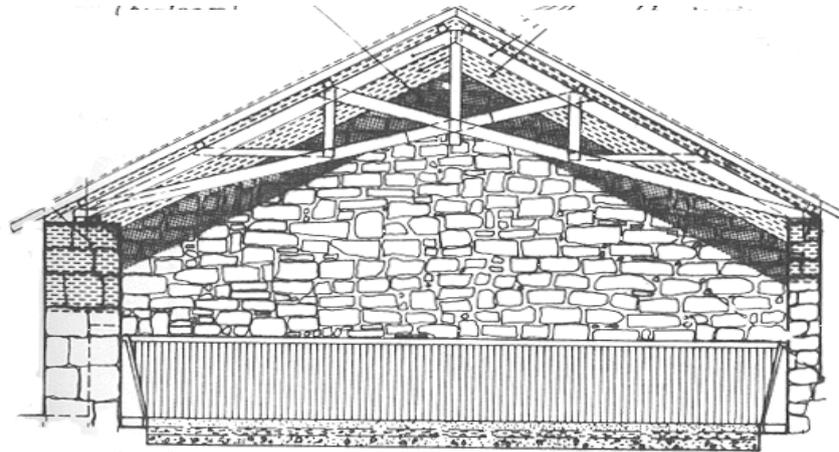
A 14.60m span scissor’s timber truss for the horse-riding building.
